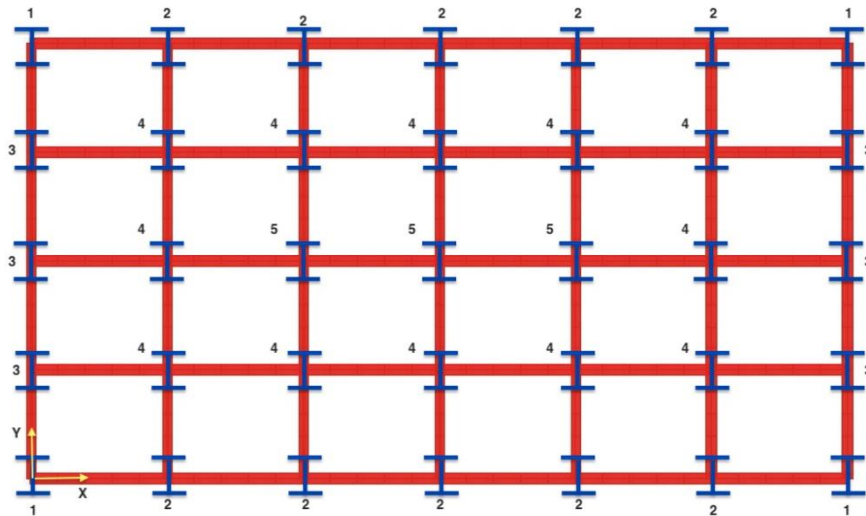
Columns grouping of the 10-story with 1026-Member steel frame in plan level
